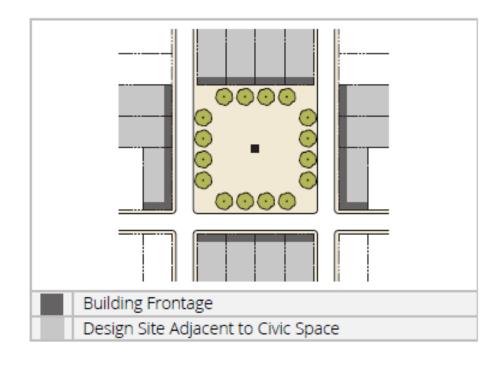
Building Frontage Adjacent to a Civic Space
